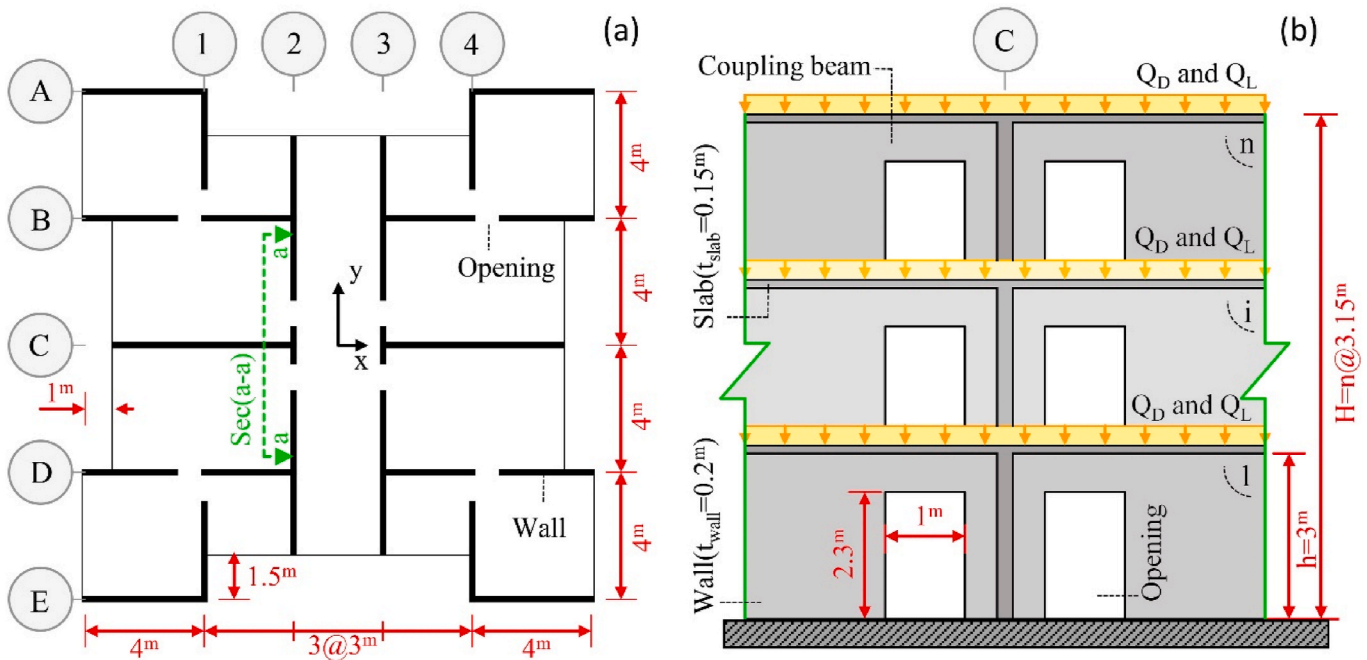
Studied tunnel-form buildings (a) Typical floor plan (b) Cross-section view "a-a" in a hypothetical n-story model.
